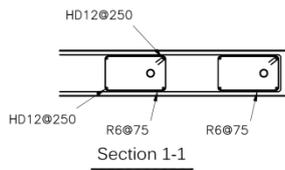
Spacing of panel vertical bars and connection bars (mm).
